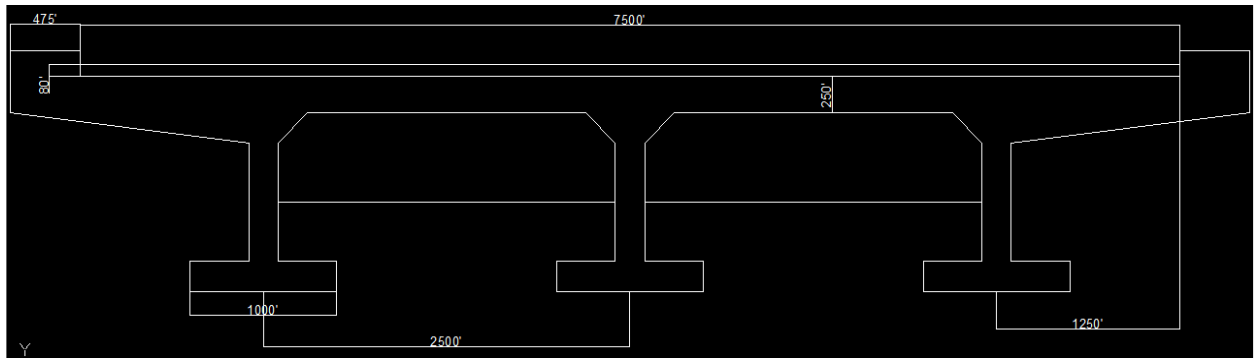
RCC I GIRDER TRANSVERSE SECTION
